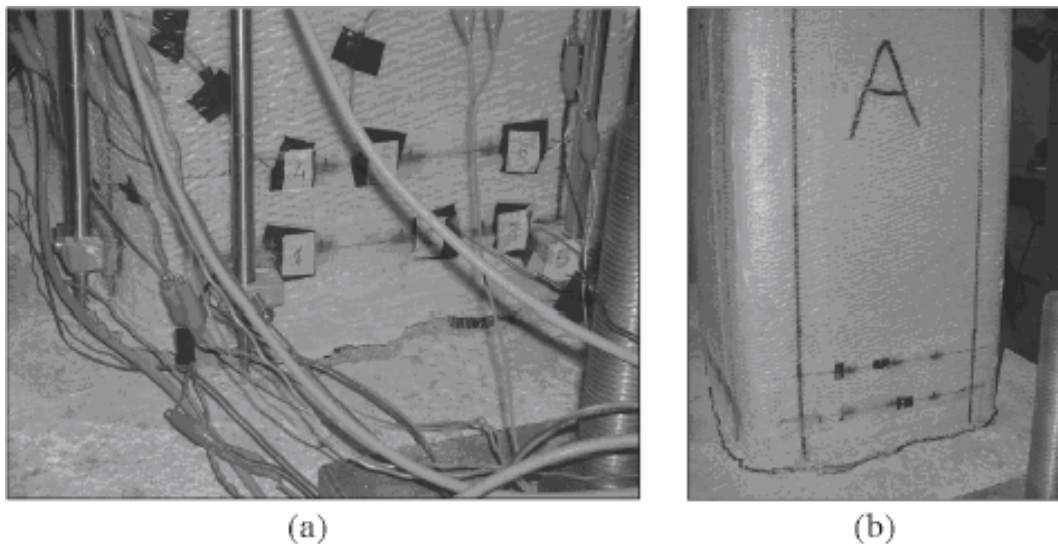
Column LP-540 at end of the test: crack at column-footing interface (a) and view of side A (b)
